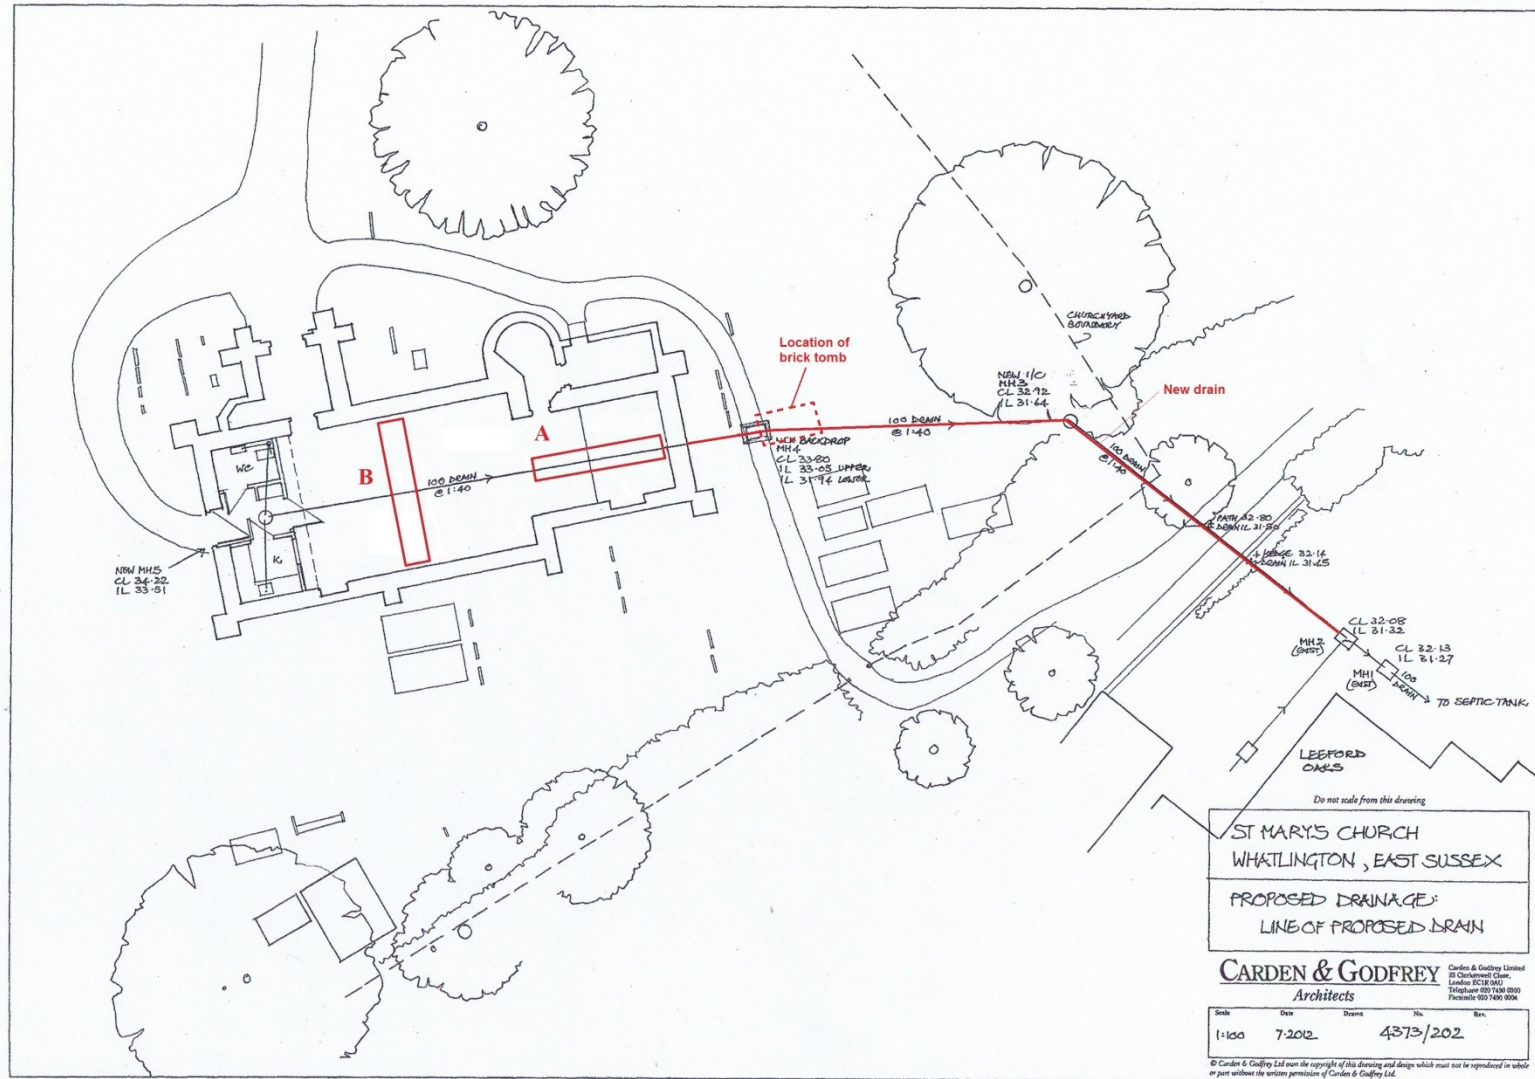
Whatlington Church: Plan showing location of evaluation trenches and drain trench
